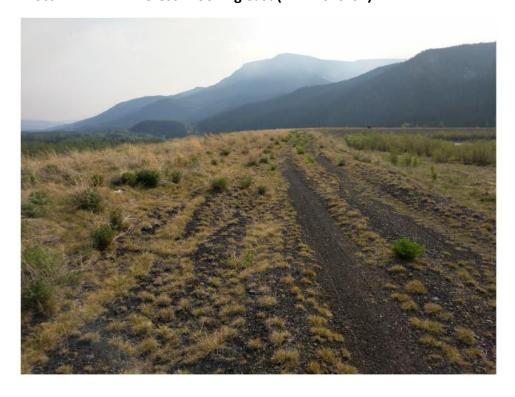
BTD Crest – looking east (BTD-2019-05)
